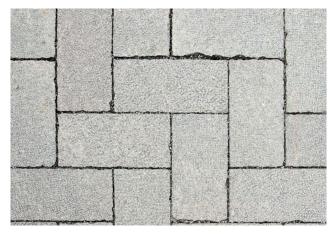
Permeable paving laid onto open graded bedding, base and sub-base layers allow percolation of water into earth.
